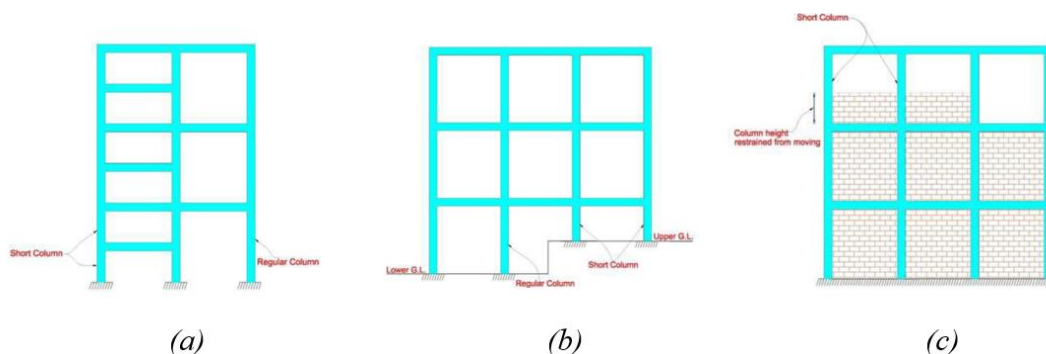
Short columns due to (a) staircase landing beams; (b) structures in slopes; (c) partial masonry infills
